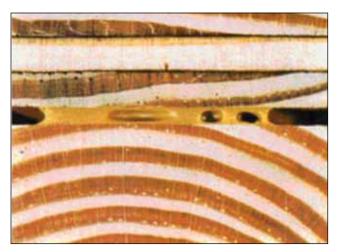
Gap-filling construction adhesive in field-assembled plywood floor system.
